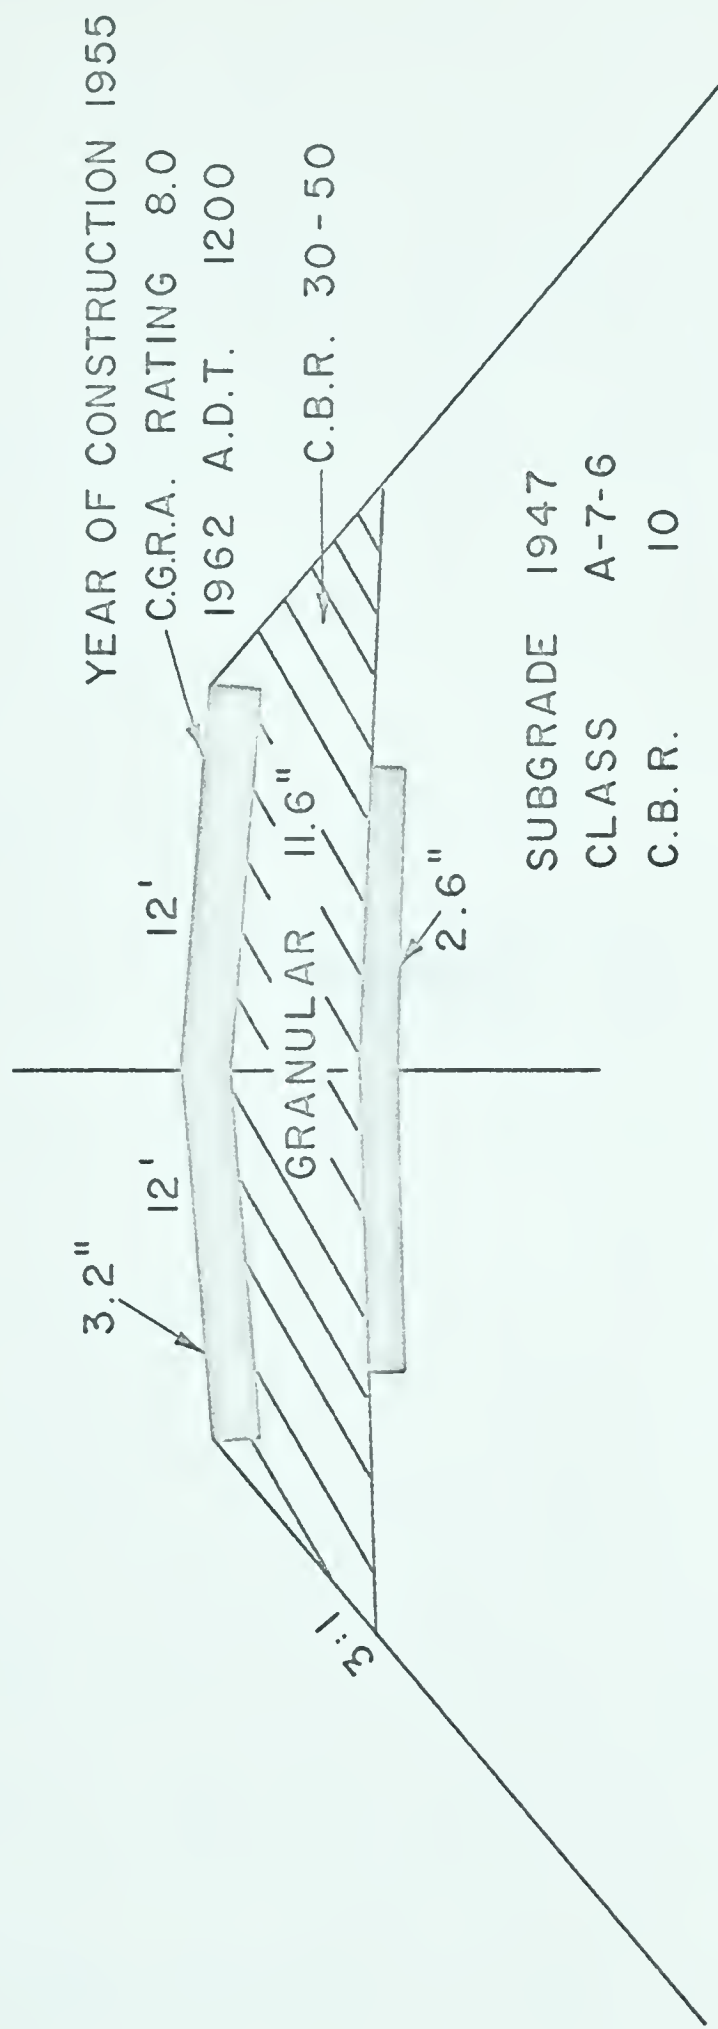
TYPICAL CROSS - SECTION, OVERLAY SYSTEM
